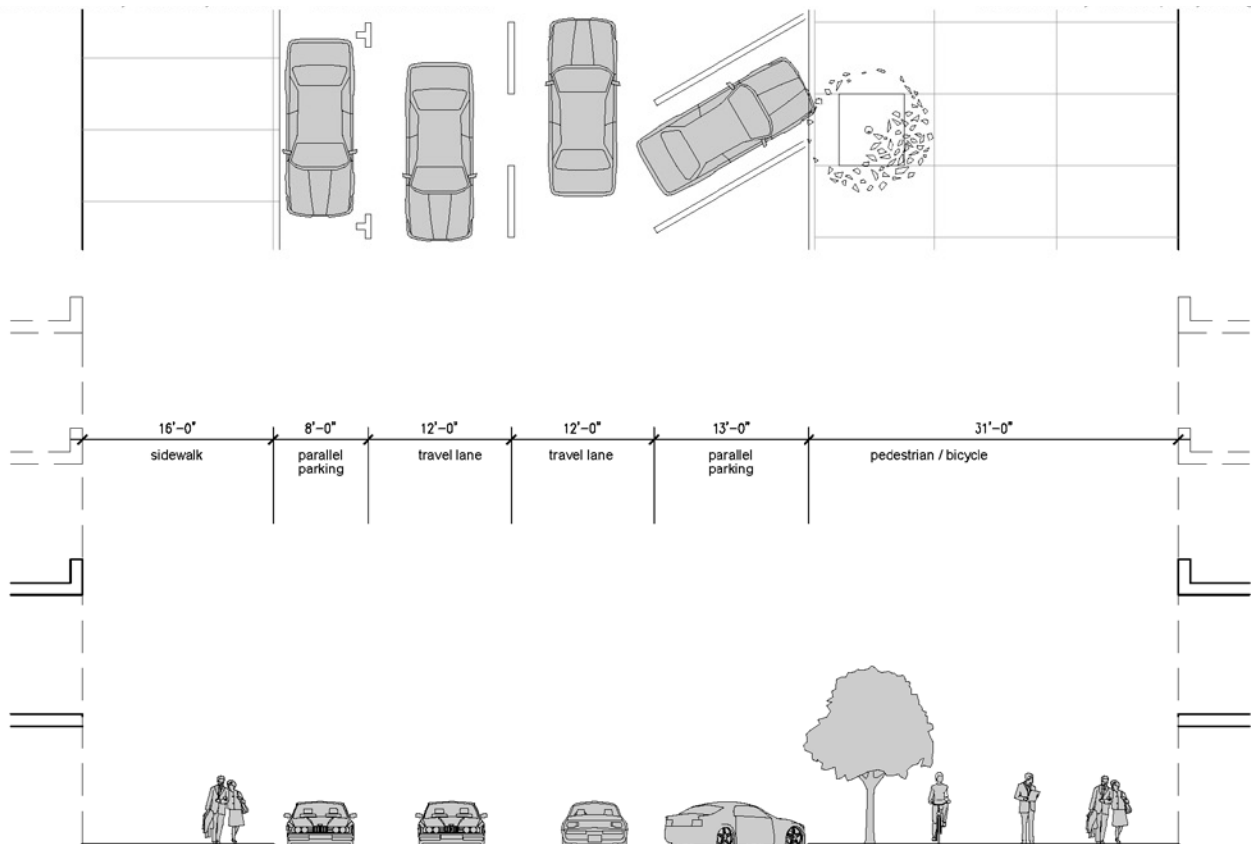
Street plan (above) and cross-section diagram (below) of Kingwood Festival Street.
